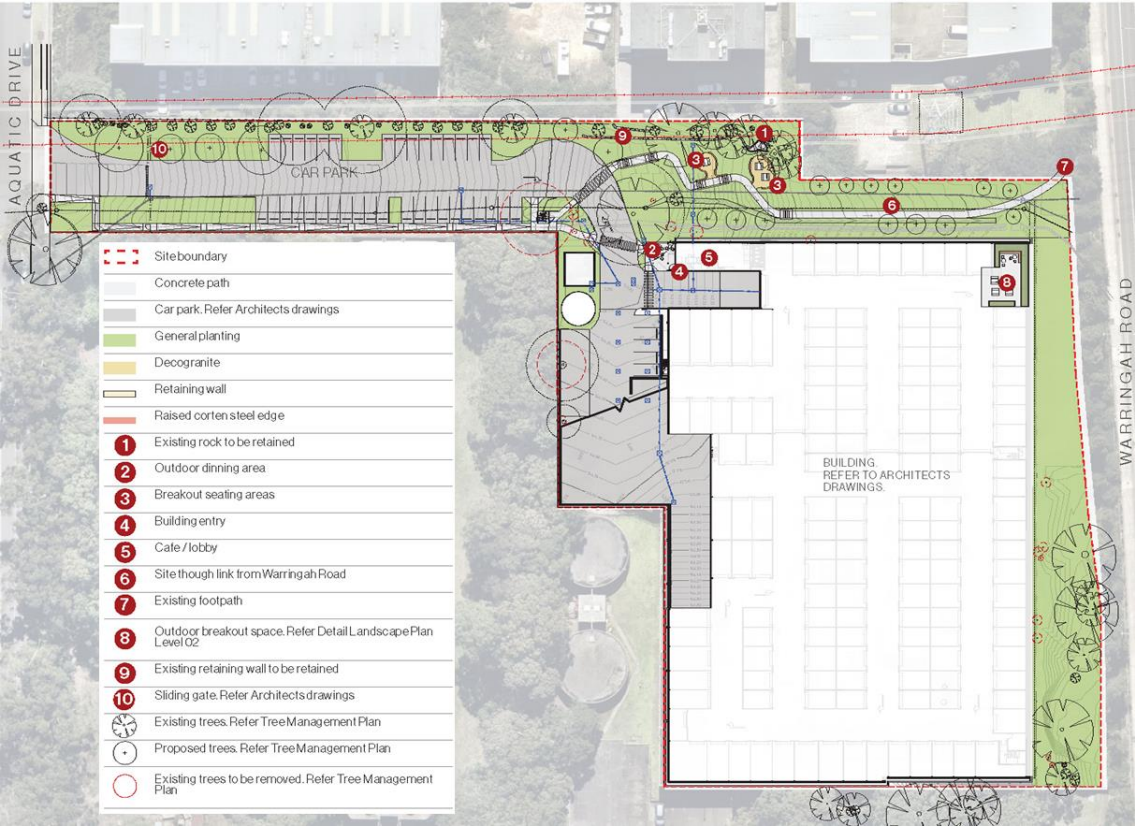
Overall Landscape Plan (Source: Place Design Group)
